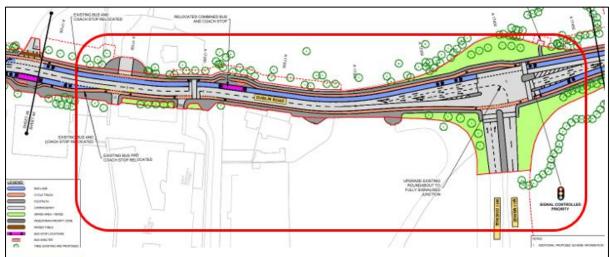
Extract from General Arrangement Drawing Dublin Road Wilford Roundabout (Sheet 49)
